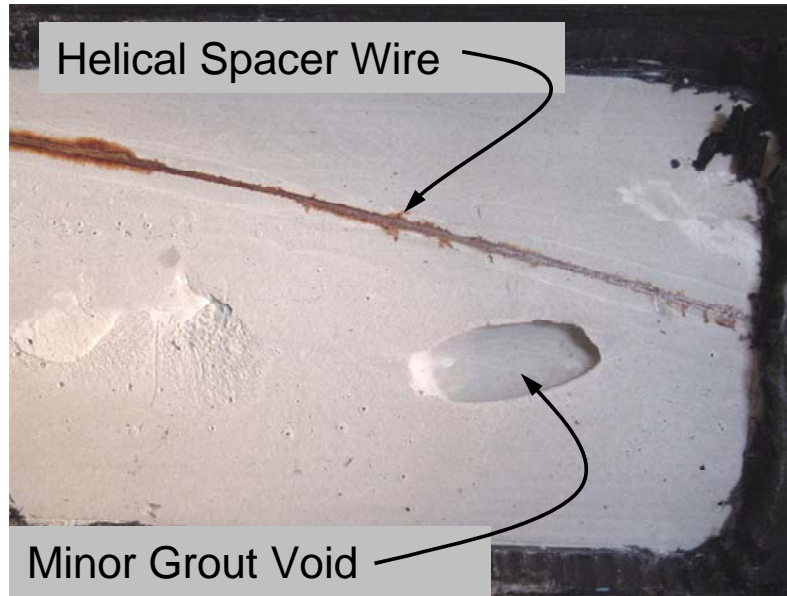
Grout Void near Tower Anchorage – Specimen 1
